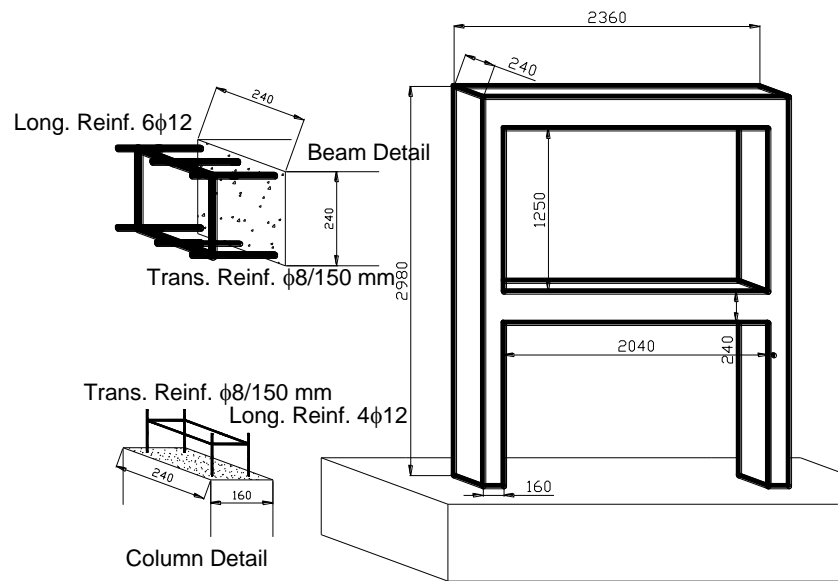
Dimensions and reinforcement details of the test frames (in mm)
